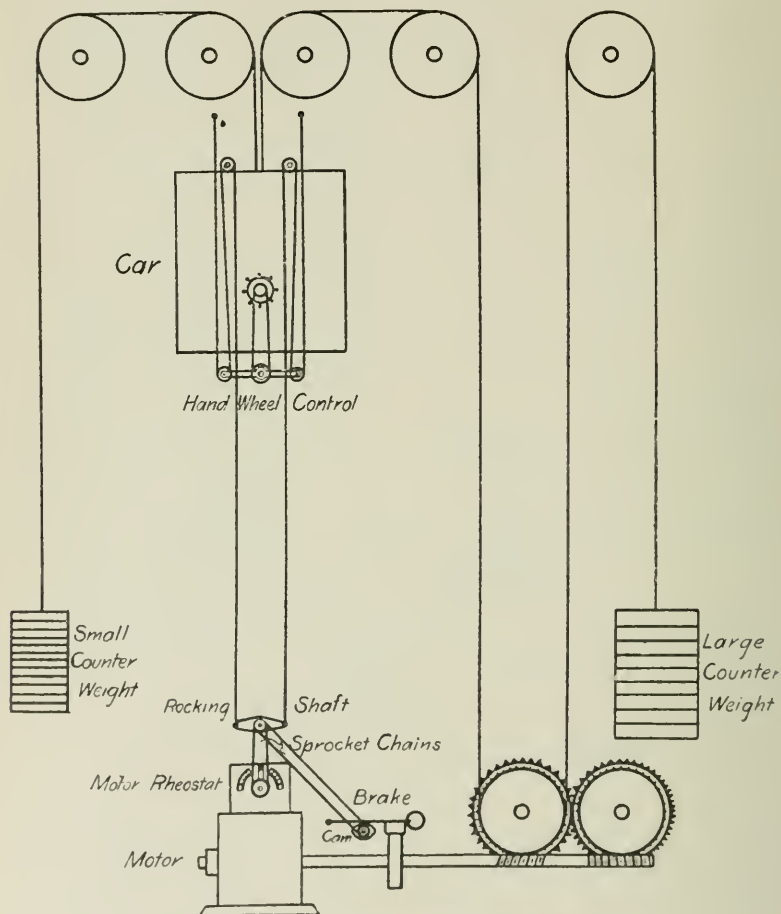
DIRECT CONNECTED ELECTRIC ELEVATOR.
